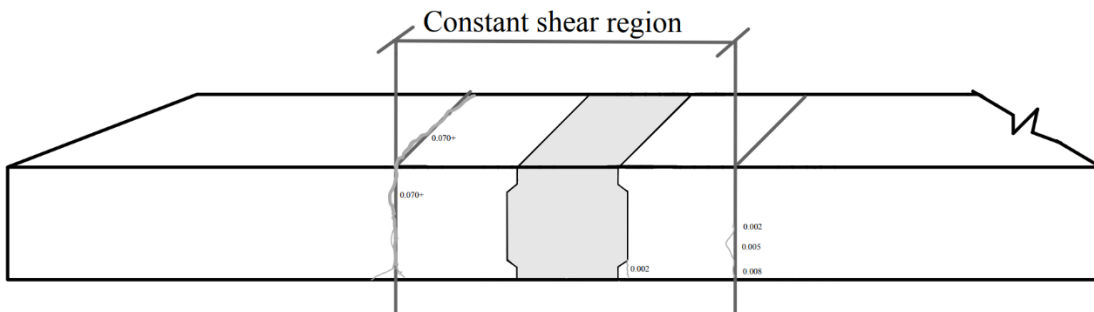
Crack Propagation for Proprietary Long-Term Specimen at Failure
